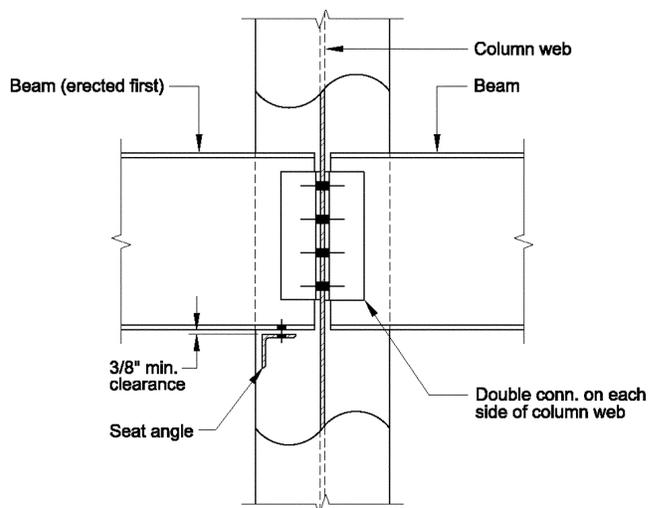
Double connection with shop-welded erection seat (alternative location).
